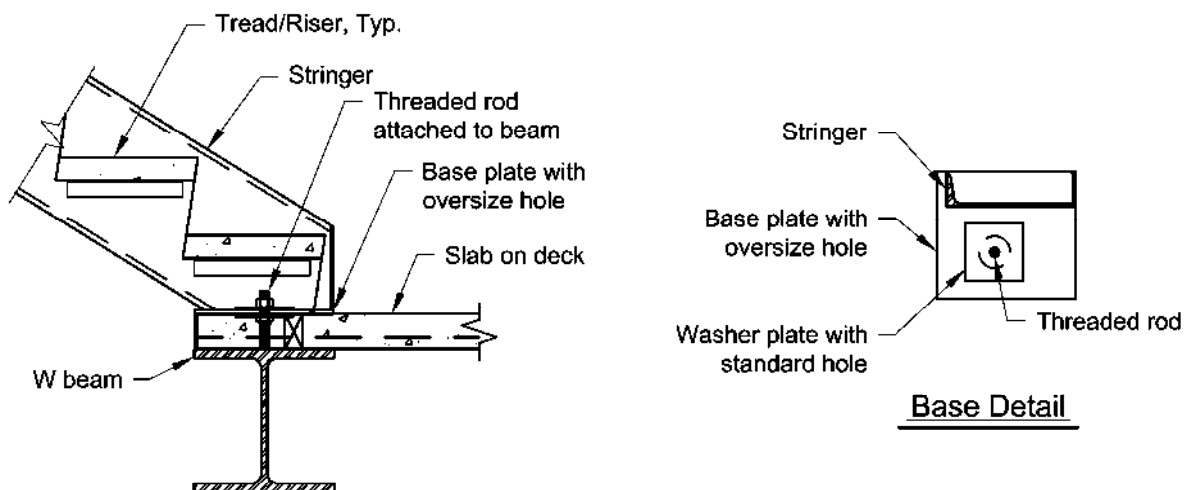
Seismic displacement detail using sliding connection at concrete slab on deck.
